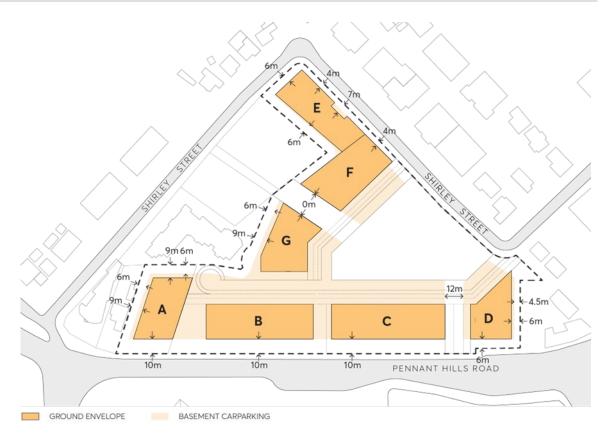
Minimum required basement and ground level building setbacks
